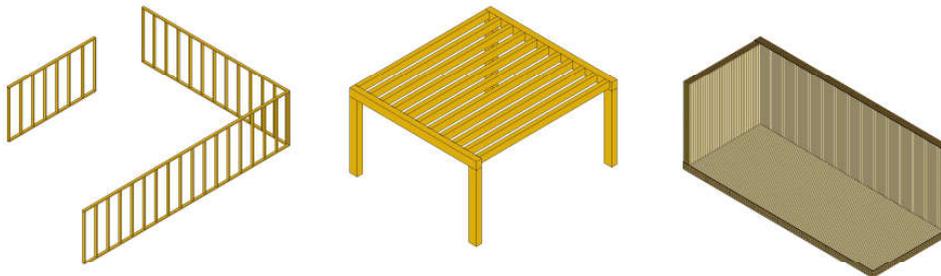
Light frame construction, Post and Beam construction and CLT construction
